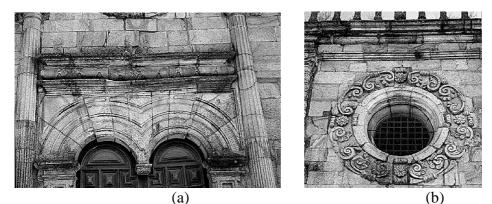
Damage in the façade: (a) twin arch and (b) opening
